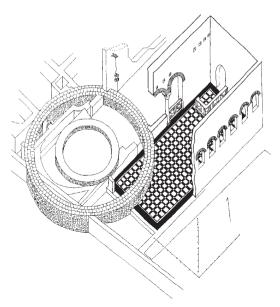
The Lateran Baptistry, foundations and preexisting buildings. Reconstruction by O. Brandt. Courtesy Olof Brandt.
